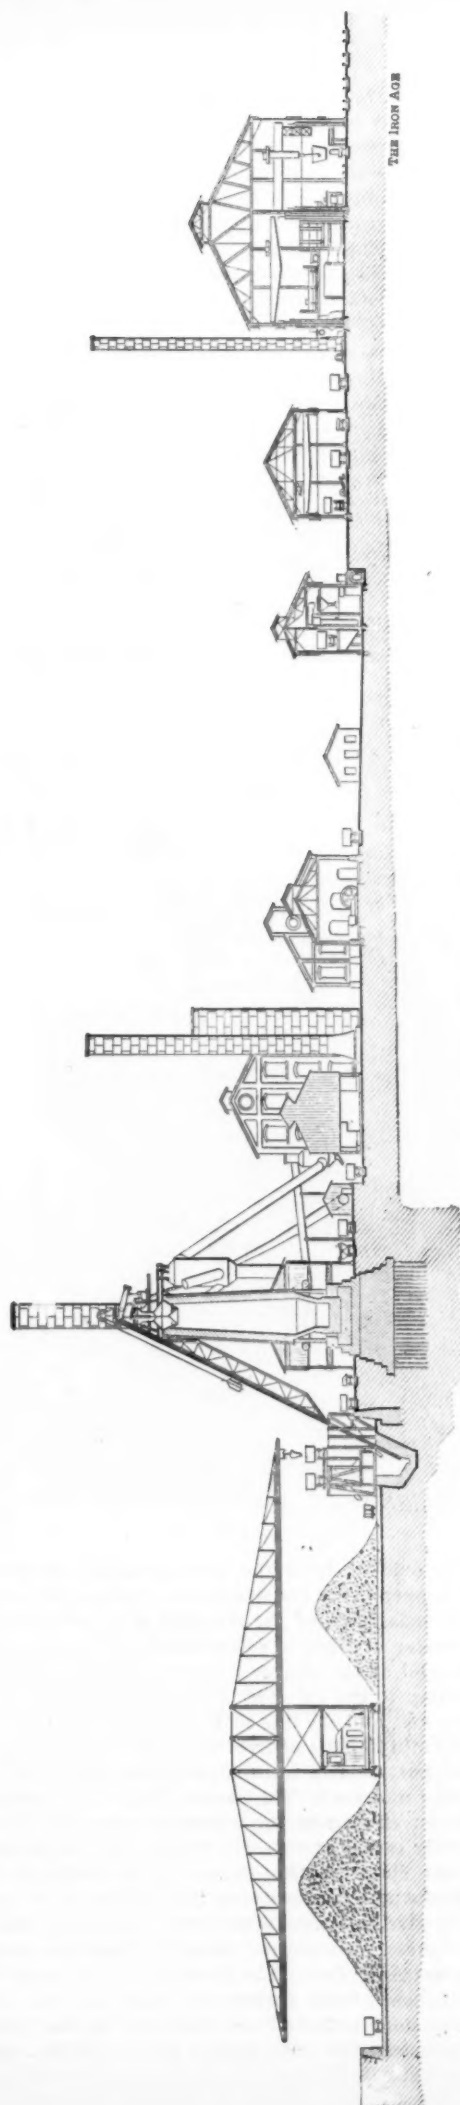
Cross Section through Blast Furnace and Open Hearth Steel Plant.
